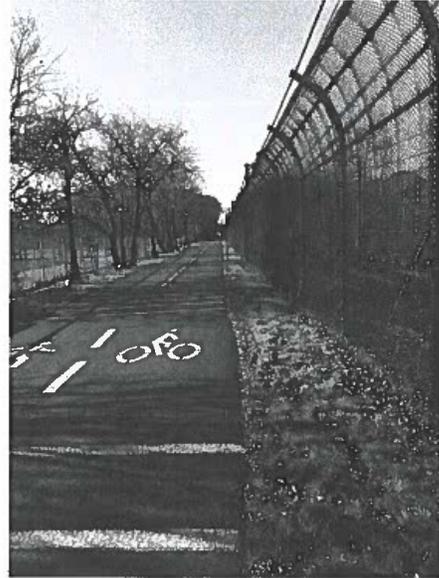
Existing East Boston Greenway Connector Path and the Blue Line track (looking south)
